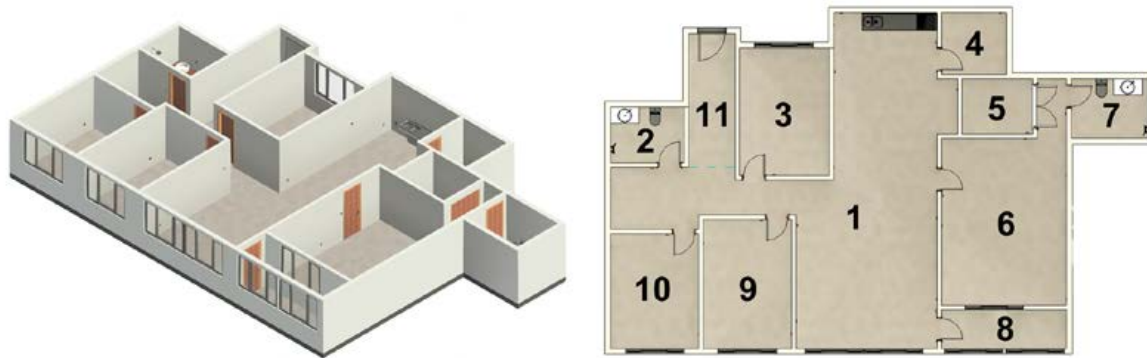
Axonometric view of the housing unit model (left) and plan of the unit (right)
